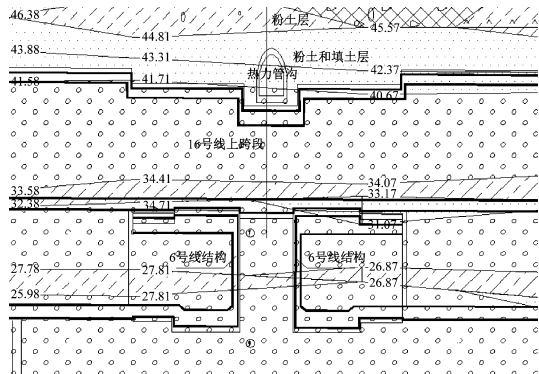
Plan of Beijing Metro Line 16 Erligou Station
